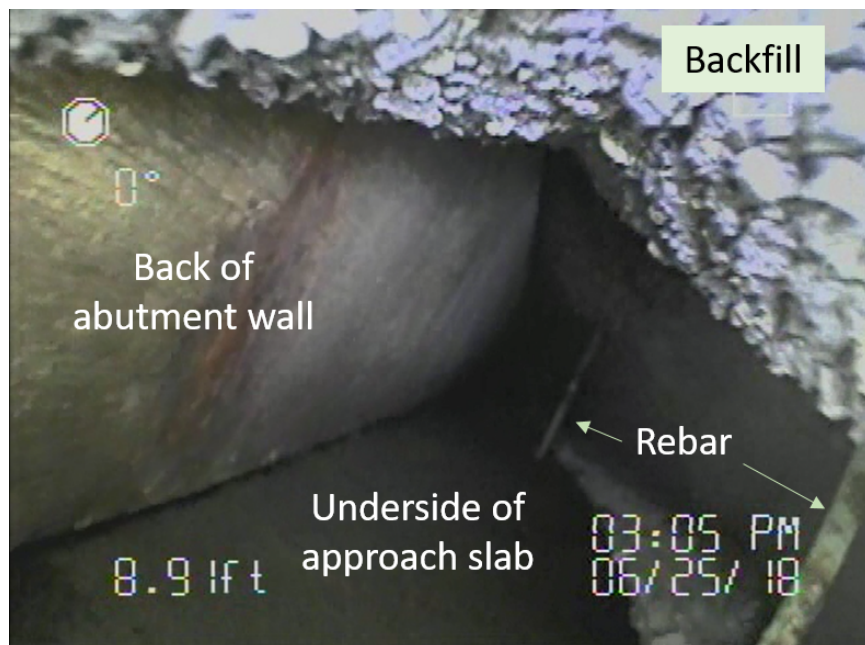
View of void beneath east approach slab of Bridge 5126.5S078 from borescope.
